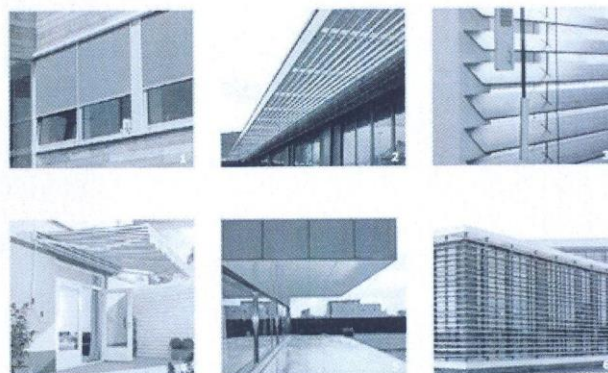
BIPV light control elements and sun shading, (Van den Ouweland, etc. 2014)
